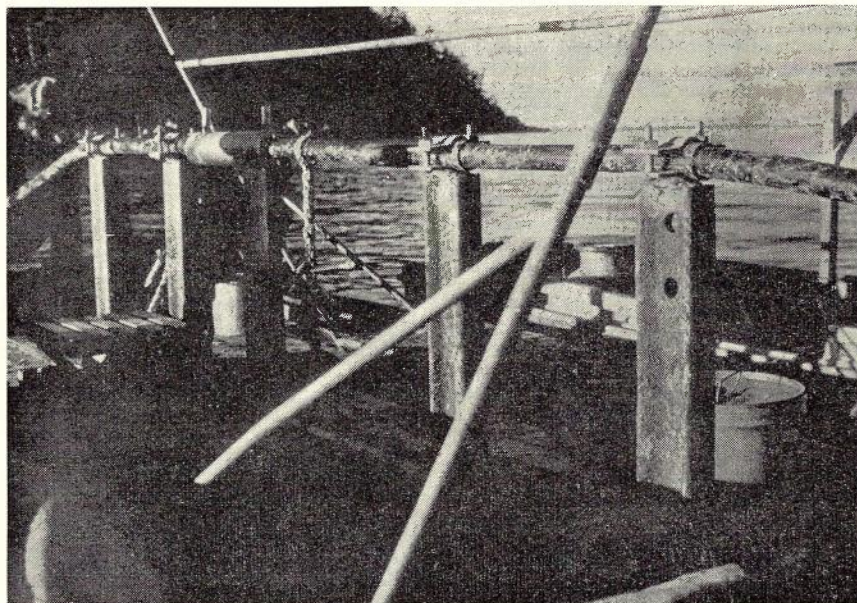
Cable support and clamps used to position and hold cable for jointing.
